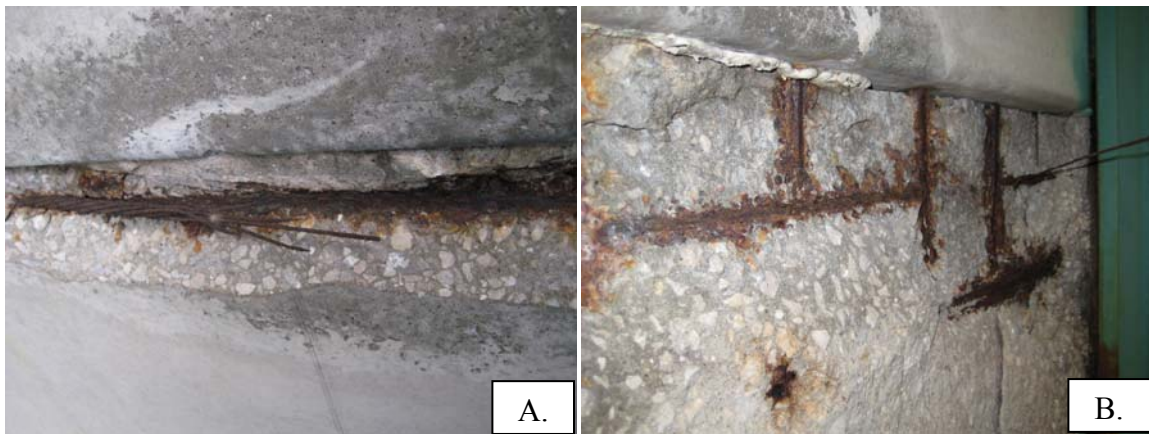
Ruptured Tendons in Spalled Section (A. Partially ruptured tendon, B. Completely ruptured tendon) (Bridge A4067)
